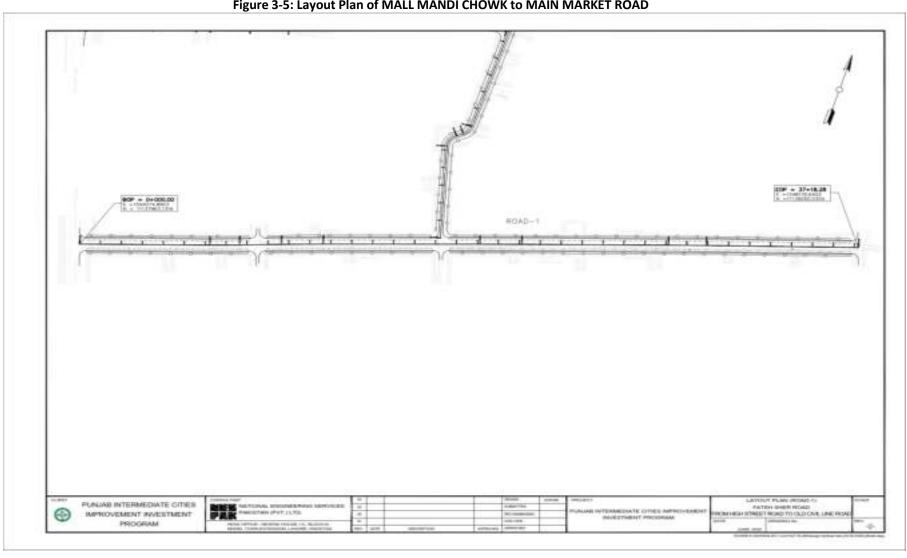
Layout Plan of MALL MANDI CHOWK to MAIN MARKET ROAD
